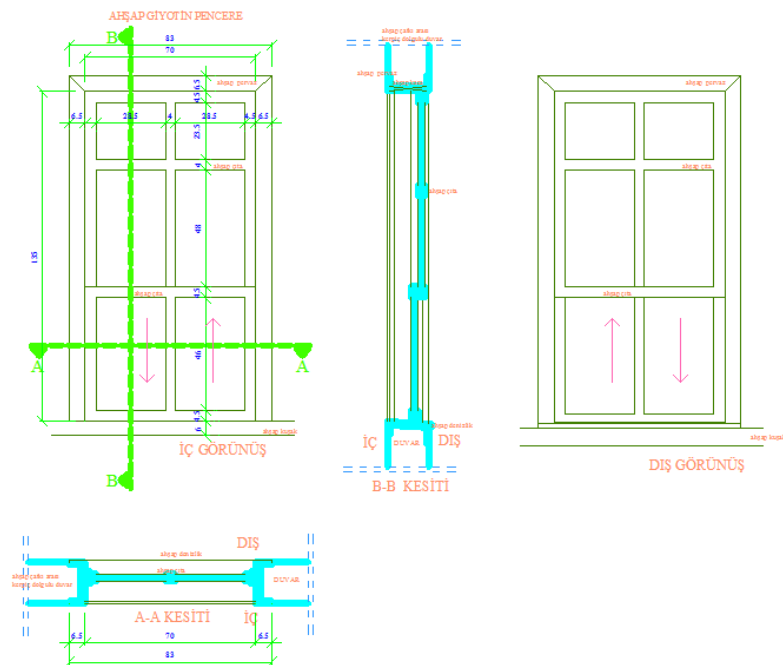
İbrahim Pilavcı House of restoration wood window detailing.
